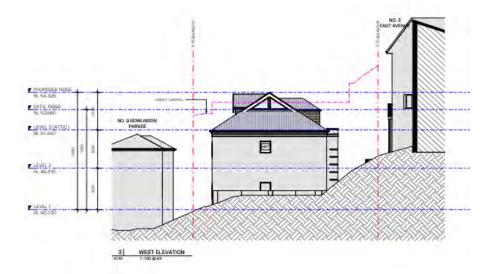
The proposed additions fit comfortably with the stepped character of development in East Avenue, and are not excessive despite the substantial scale of No. 3 East Avenue. Source: Dieppe Design
